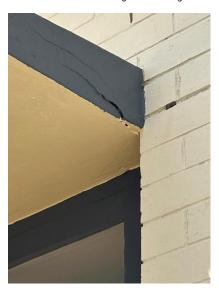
Cracking to Reinforced Concrete Awning
